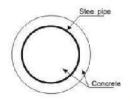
(d) Composite column (steel pipe) Figure 3.1 Tied, helically bound and composite columns
